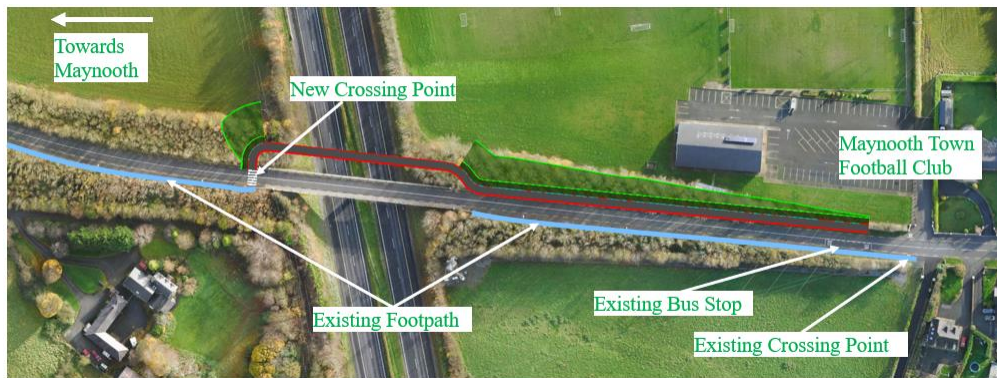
Option 2 - Active Travel Overbridge east of the existing R408 Newtown Road Overbridge
